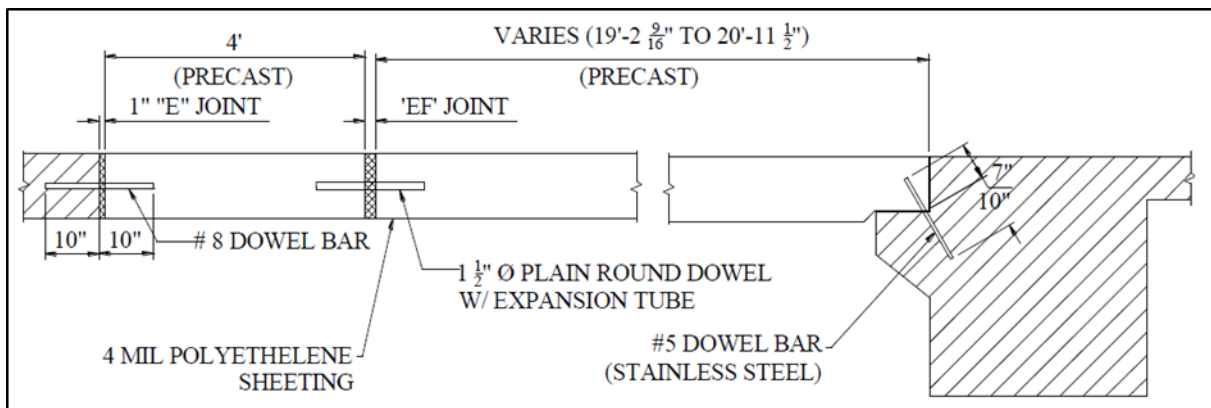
Elevation View of Precast Approach Slab (Nadermann et al. 2010)
